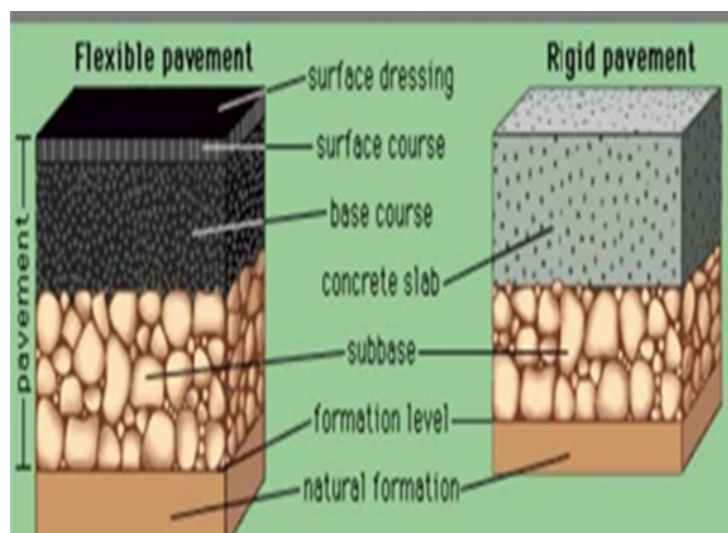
(a) Flexible pavement and (b) rigid pavement. Source: Encyclopedia Britannica Inc, (1999)
